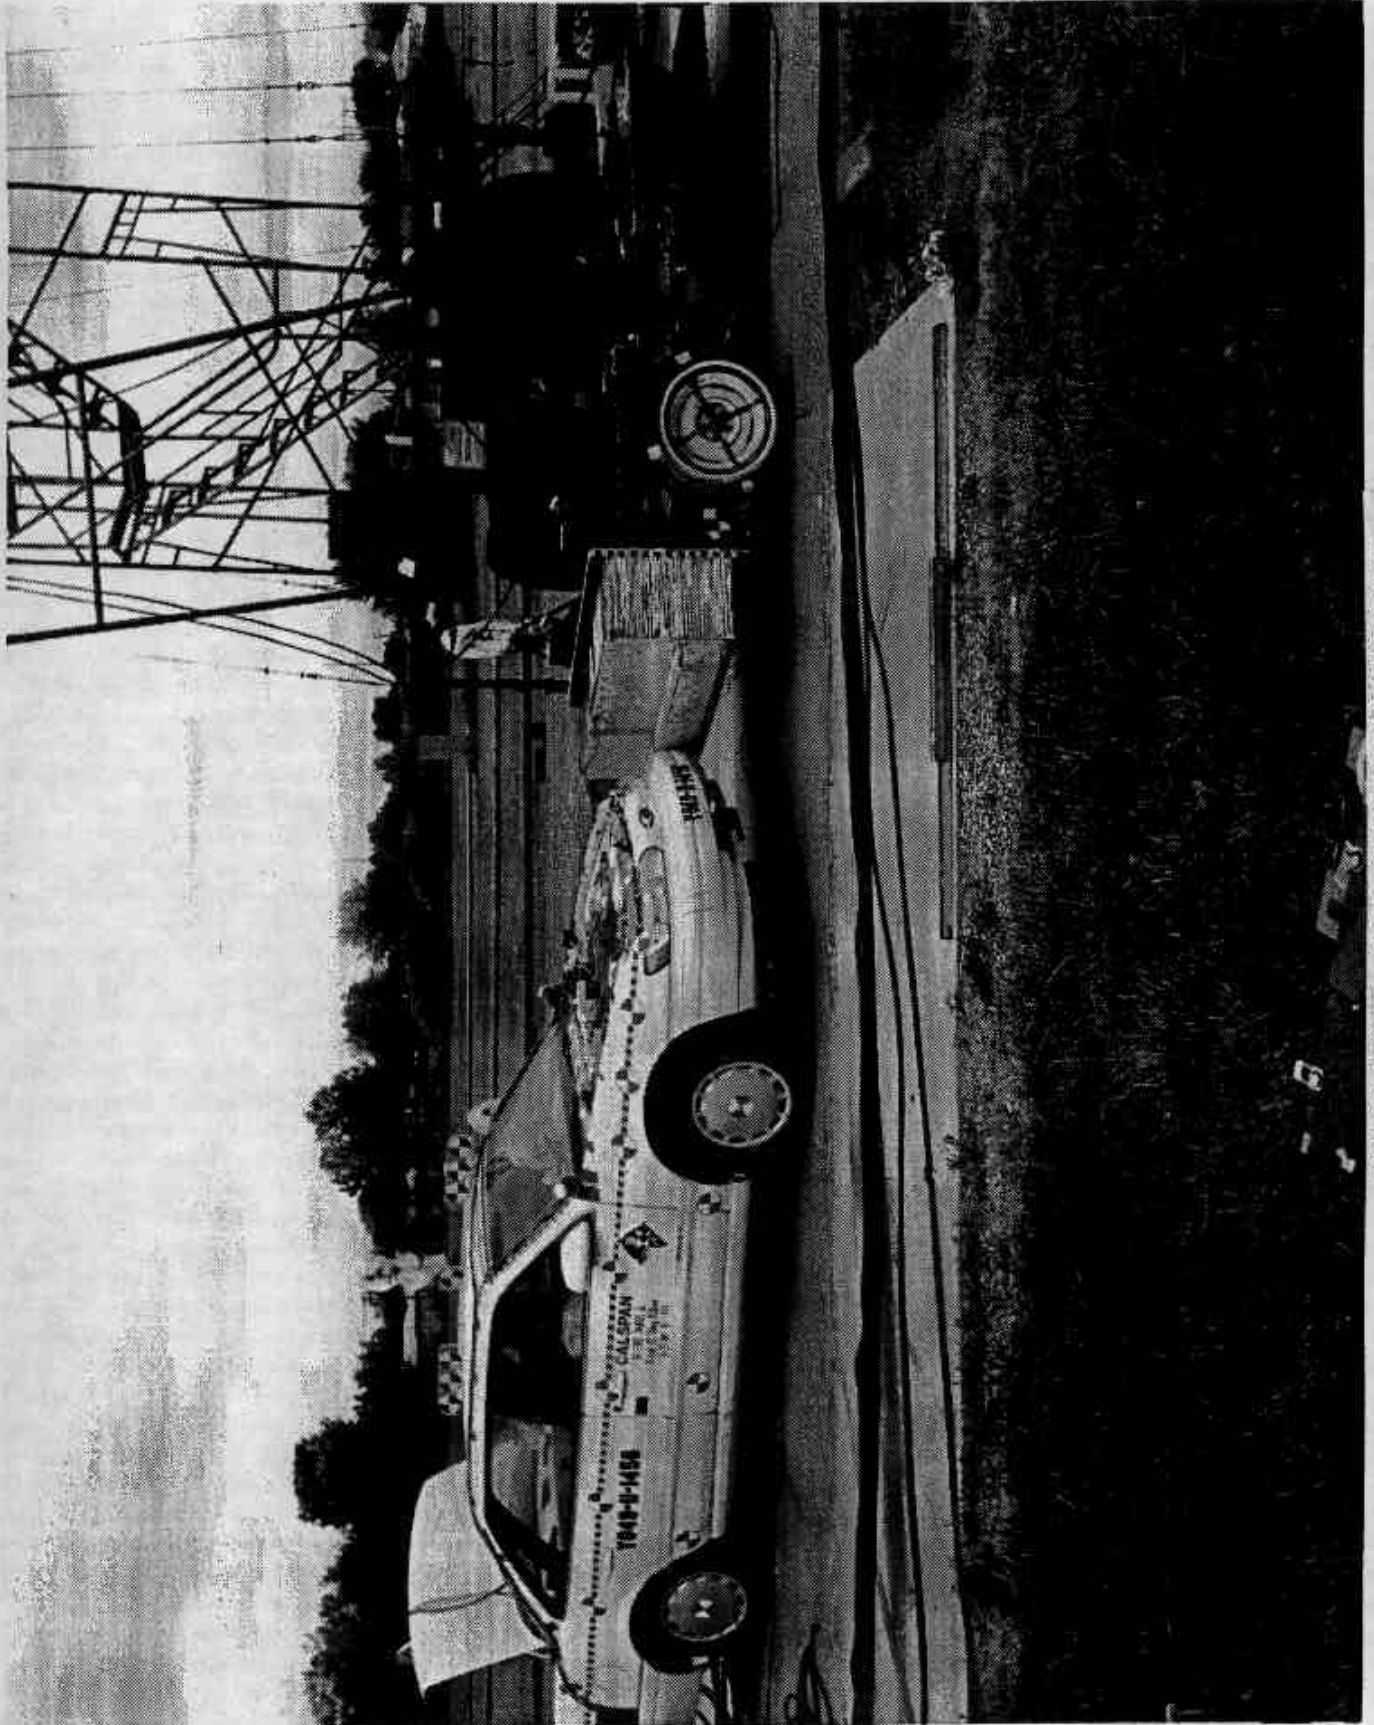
PRE-TEST OVERALL SIDE VIEW
